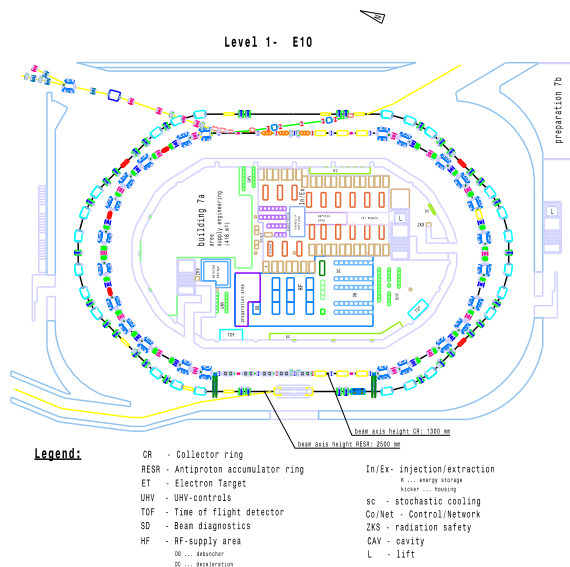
Floor plan of the CR/RESR ring tunnel and the inner area for technical systems.
